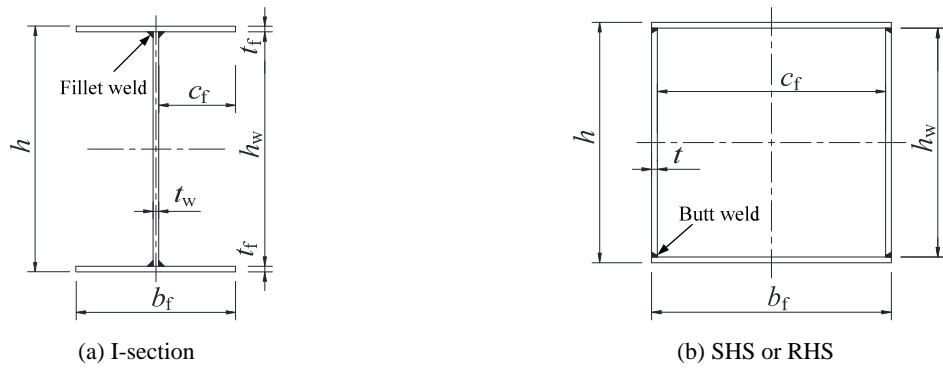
Definition of symbols and weld locations for the specimens
